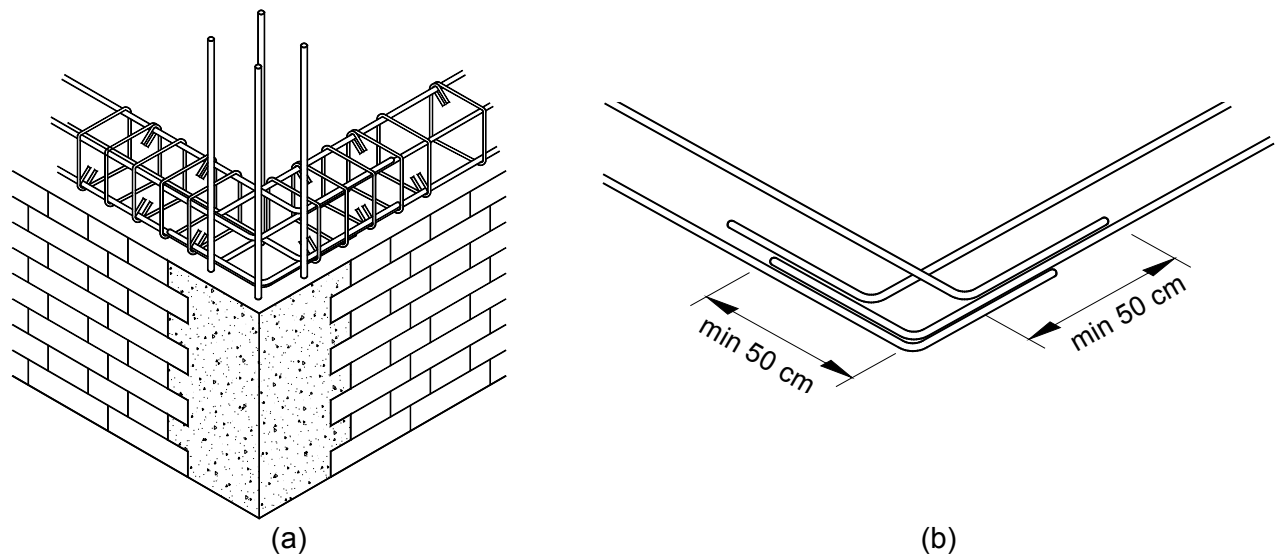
Tie-beam construction: a) wall intersections; b) hooked anchorage for longitudinal reinforcement is a must (Brzev, 2008).
